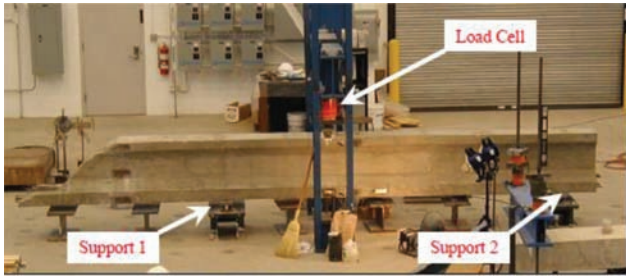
Test setup for the PSC beam. (Source: Wood et al., 2007.)
